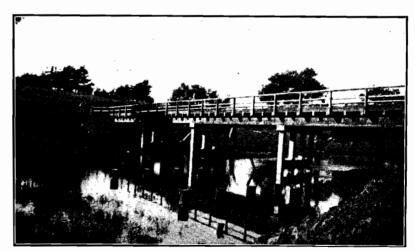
New bridge erected over Mount Emu Creek in the Shire of Hampden.
